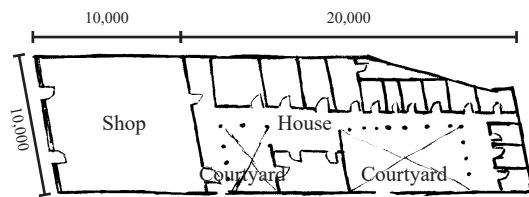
Floor plan Cirebonese Europeanized Shophouse (Siregar, 1990, P. 78)
